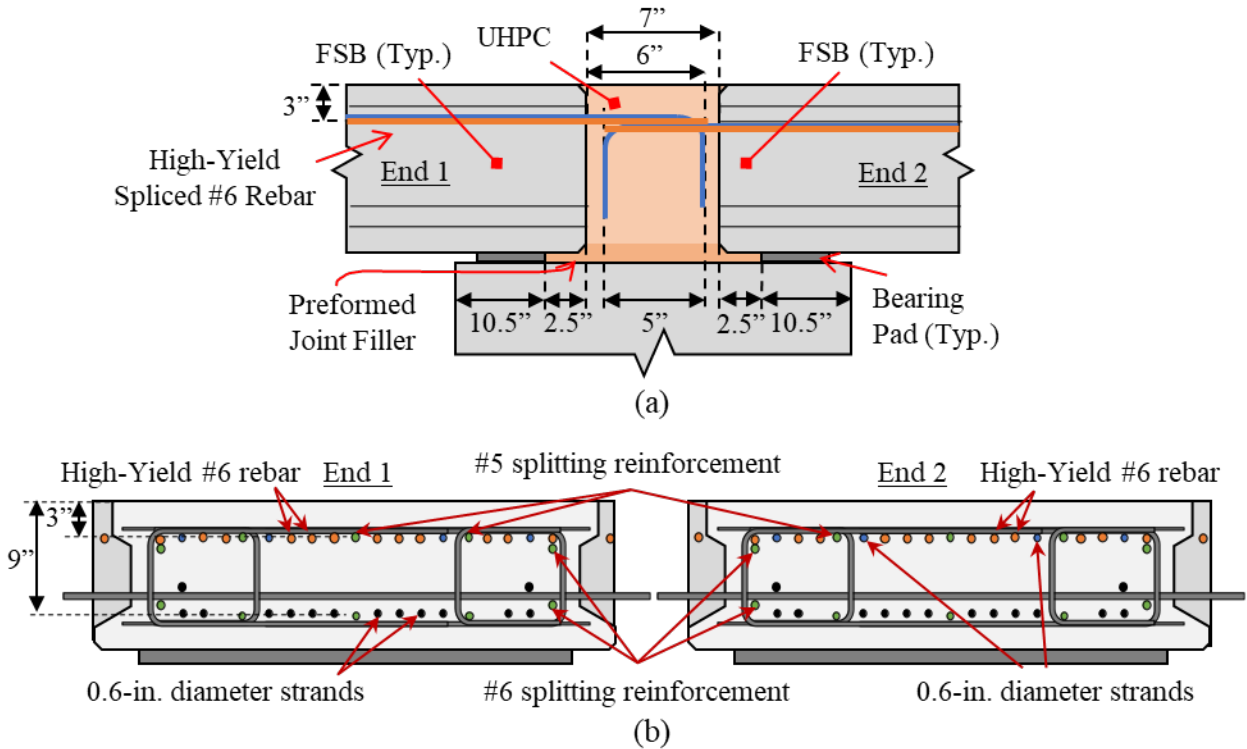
Negative moment connection with high-yield reinforcement and non-prestressed hooked strands: (a) elevation and (b) ends view
